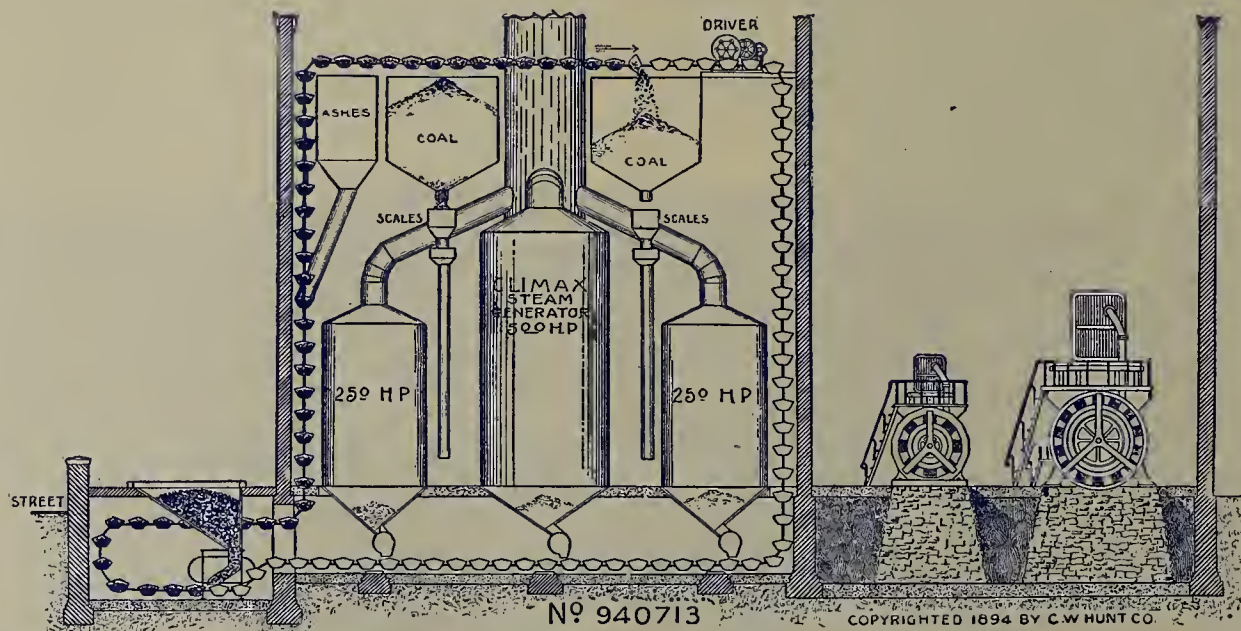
SECTIONAL VIEW SHOWING ARRANGEMENT OF THE COAL HANDLING MACHINERY.
